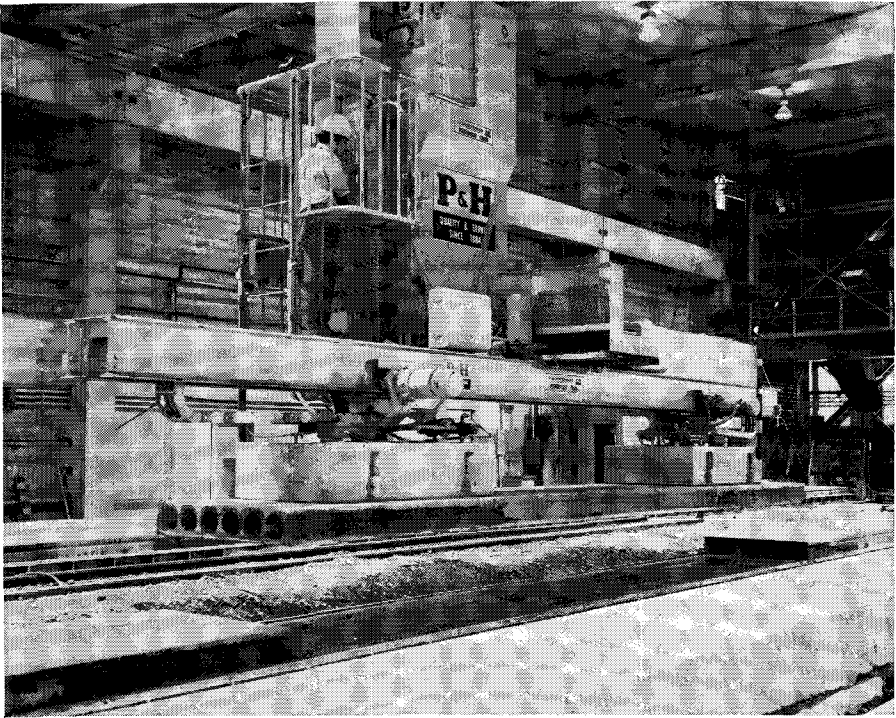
Stacker crane lifting hollow-core slab with vacuum pads.
